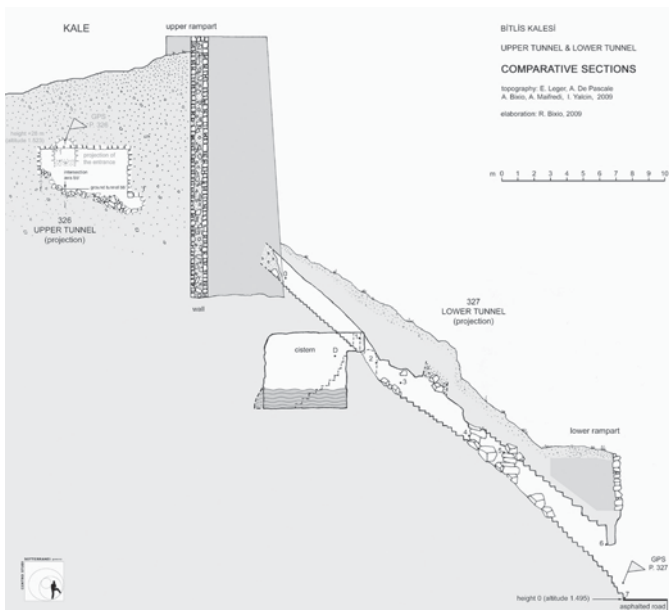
Bitlis Kale, plans of Upper Tunnel (326) and Lower Tunnel (327) compared with the walls of the castle (drawing R. Bixio).
